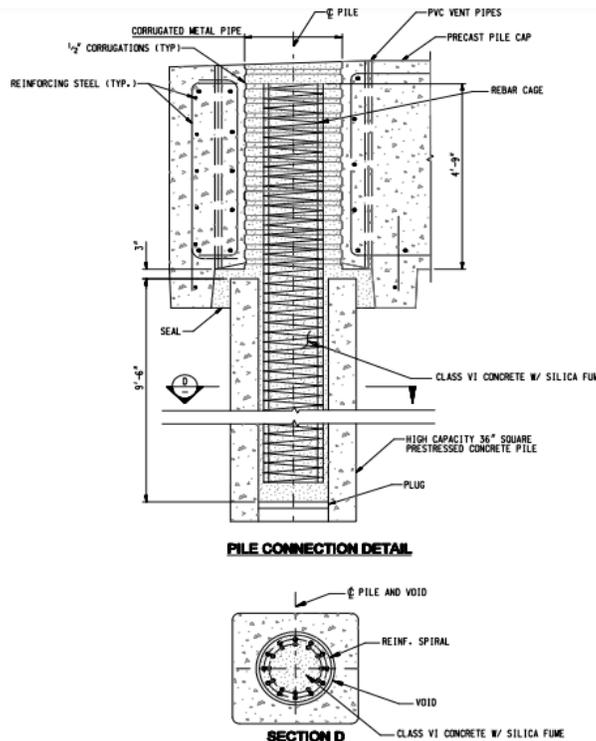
Connection details between concrete square pile and pile cap [8].
